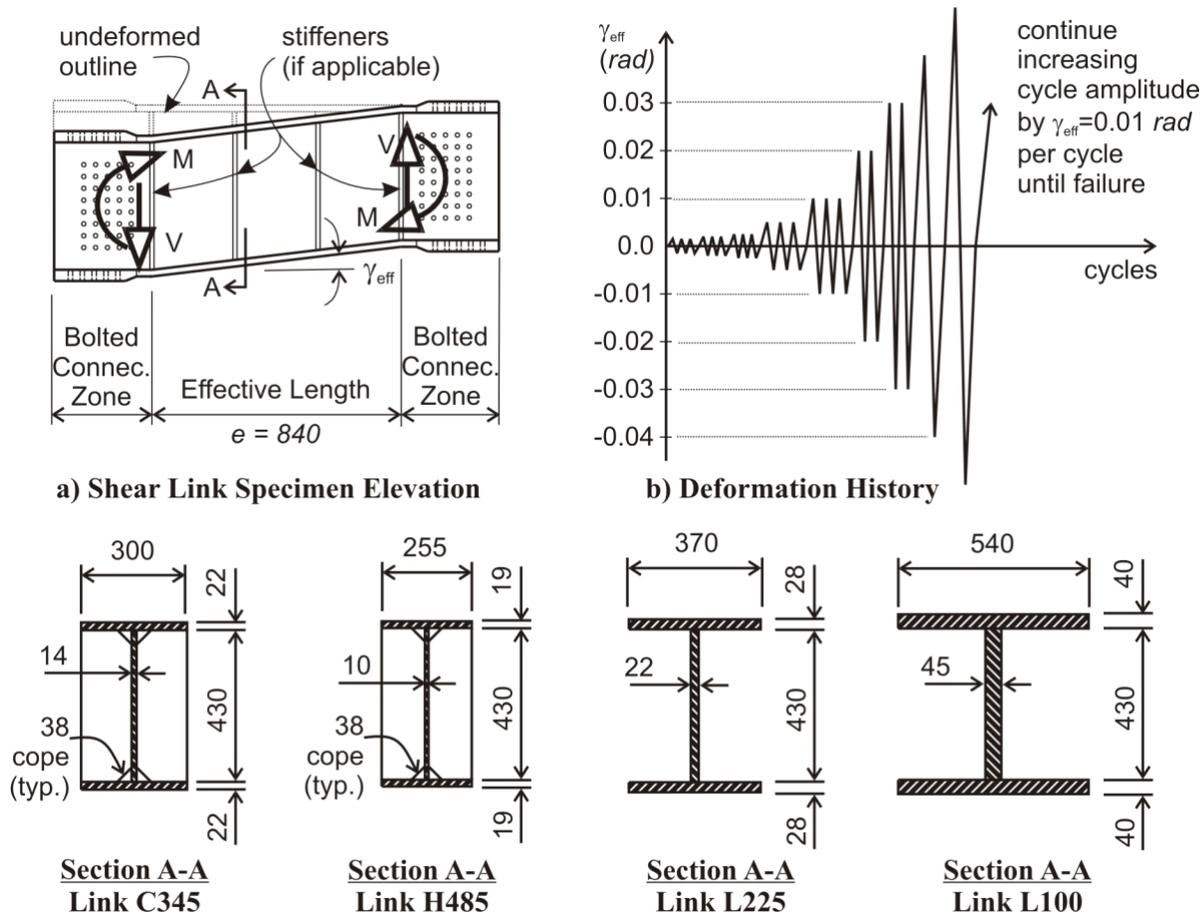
General Layout of Shear Link Specimens (dimensions in mm)
